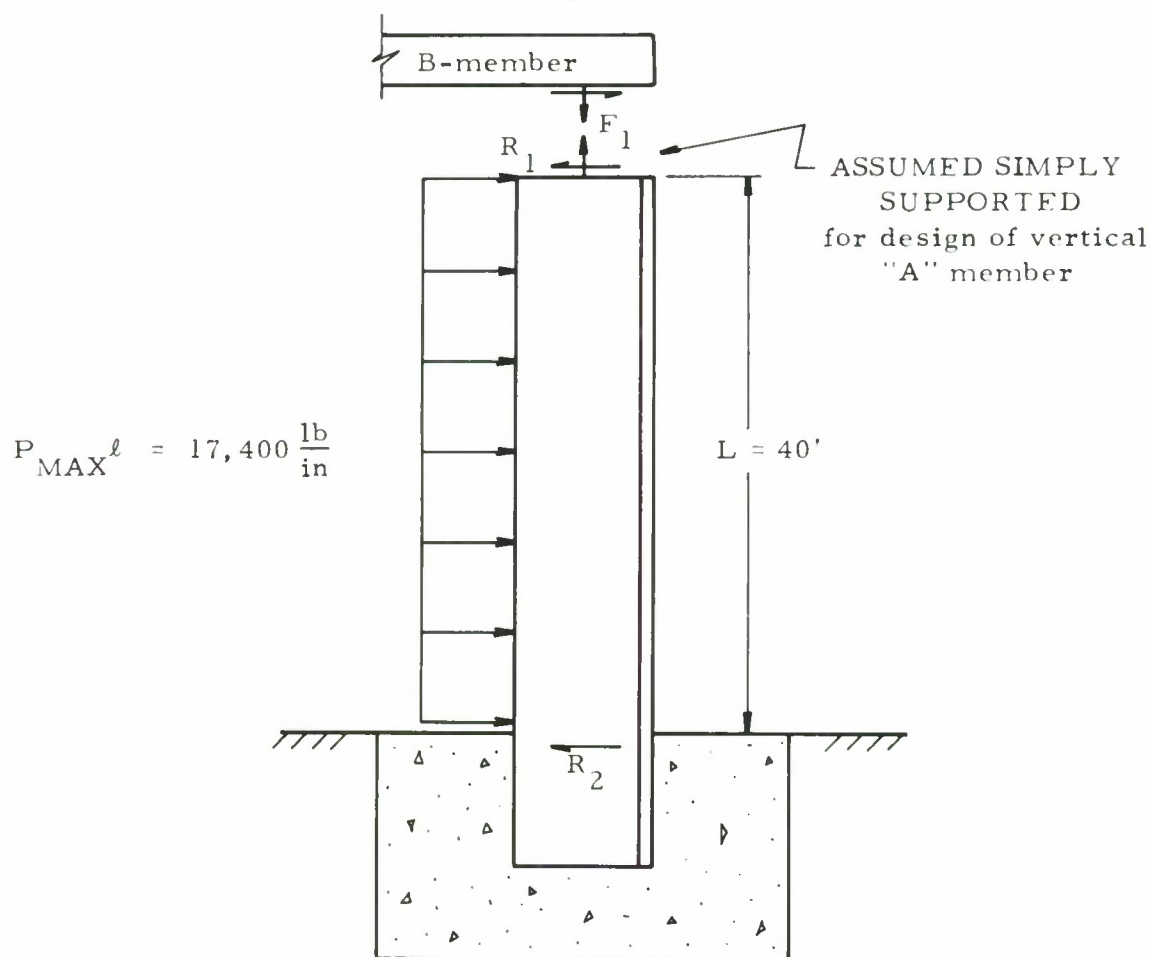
LOAD TRANSFER THROUGH INTERIOR A-MEMBER
